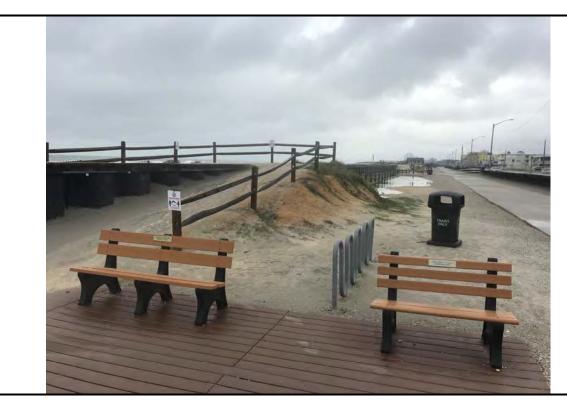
View of typical beach access over steel bulkhead at 10^{th} Avenue looking southwest.
